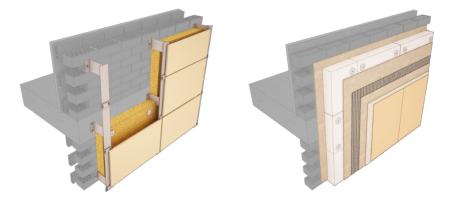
Ventilated façade system (left) and ETICS façade (right)
